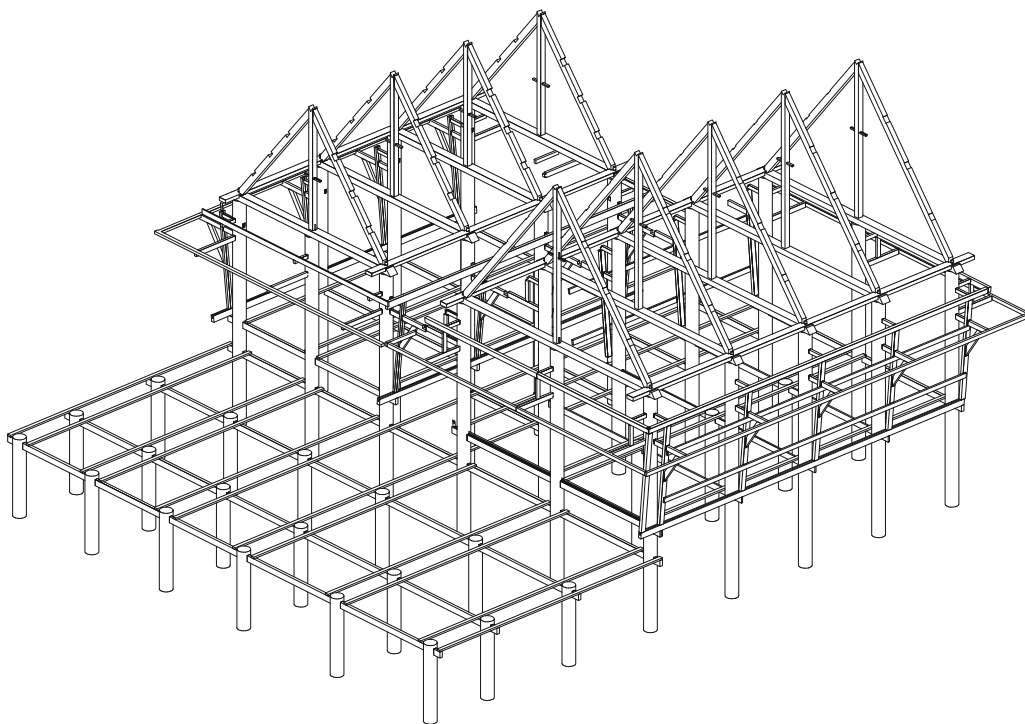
Axonometric view of Phaya Ping house without roof shaping member
